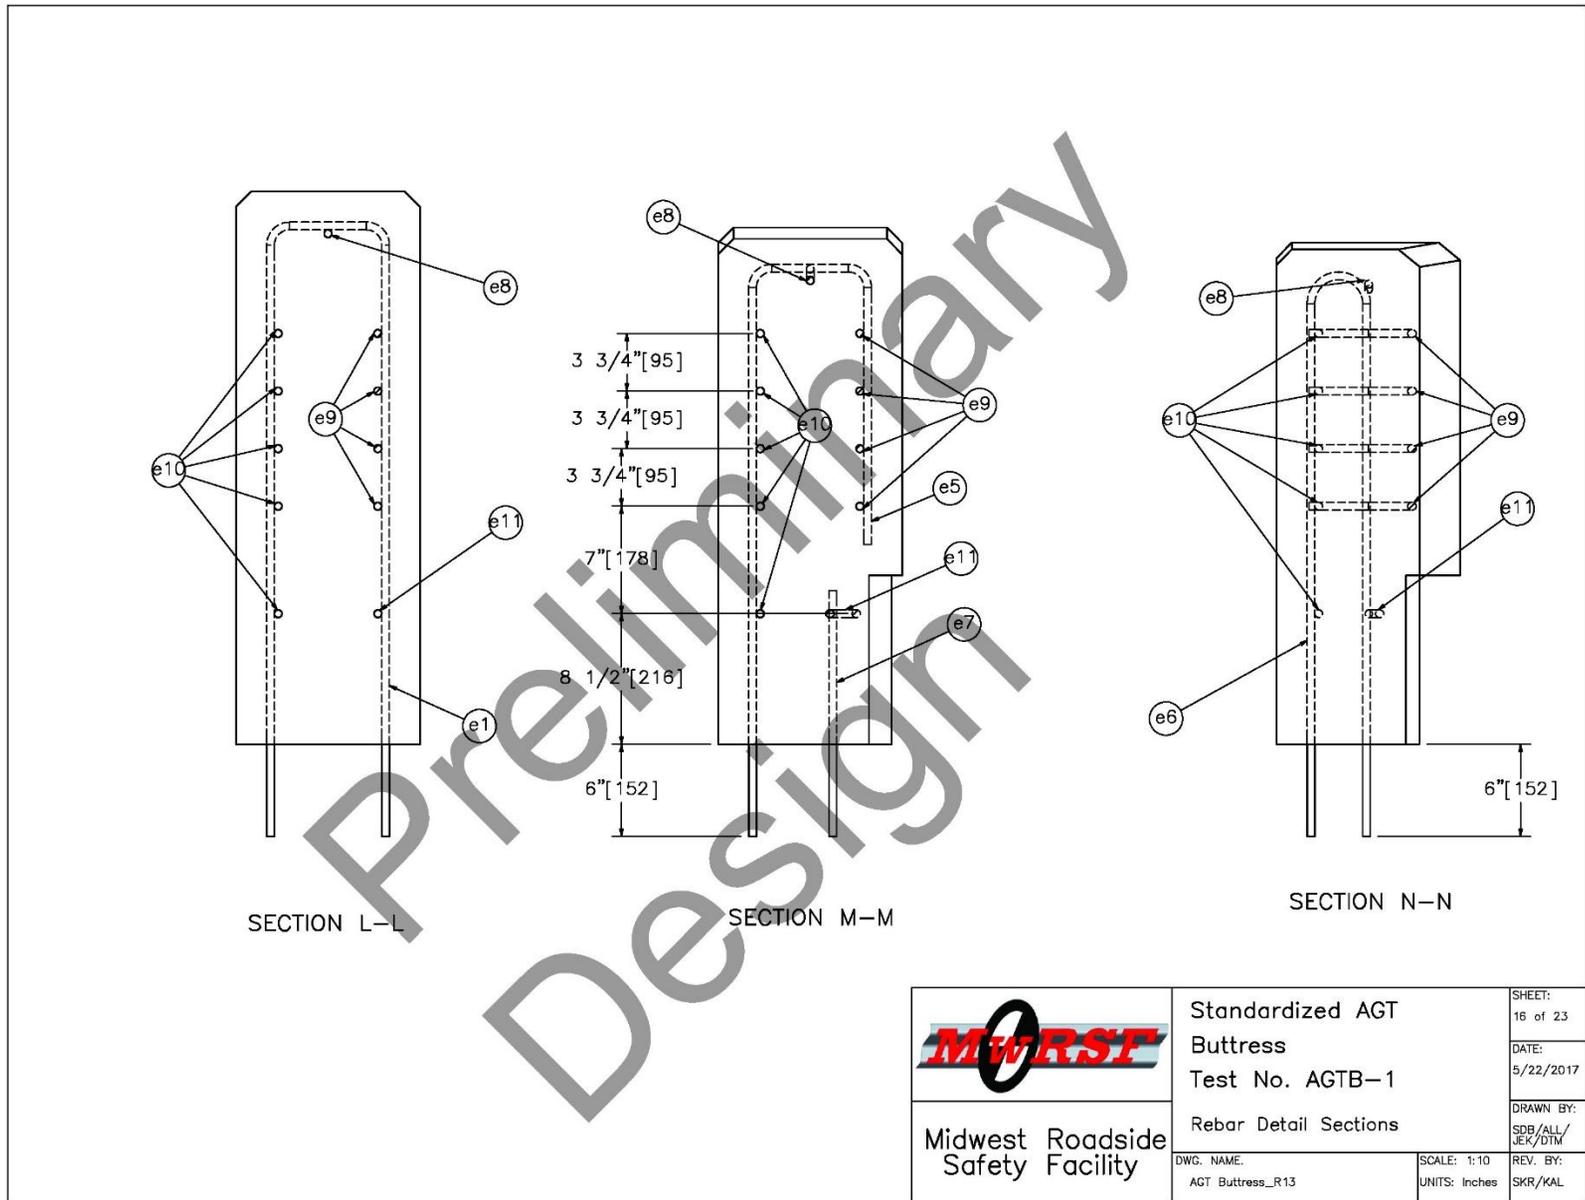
Buttress Cross Section Details, Test No. AGTB-1
